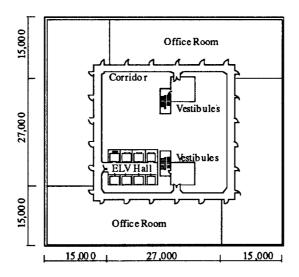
Typical Floor Plan for Applications of the Evacuation Model
